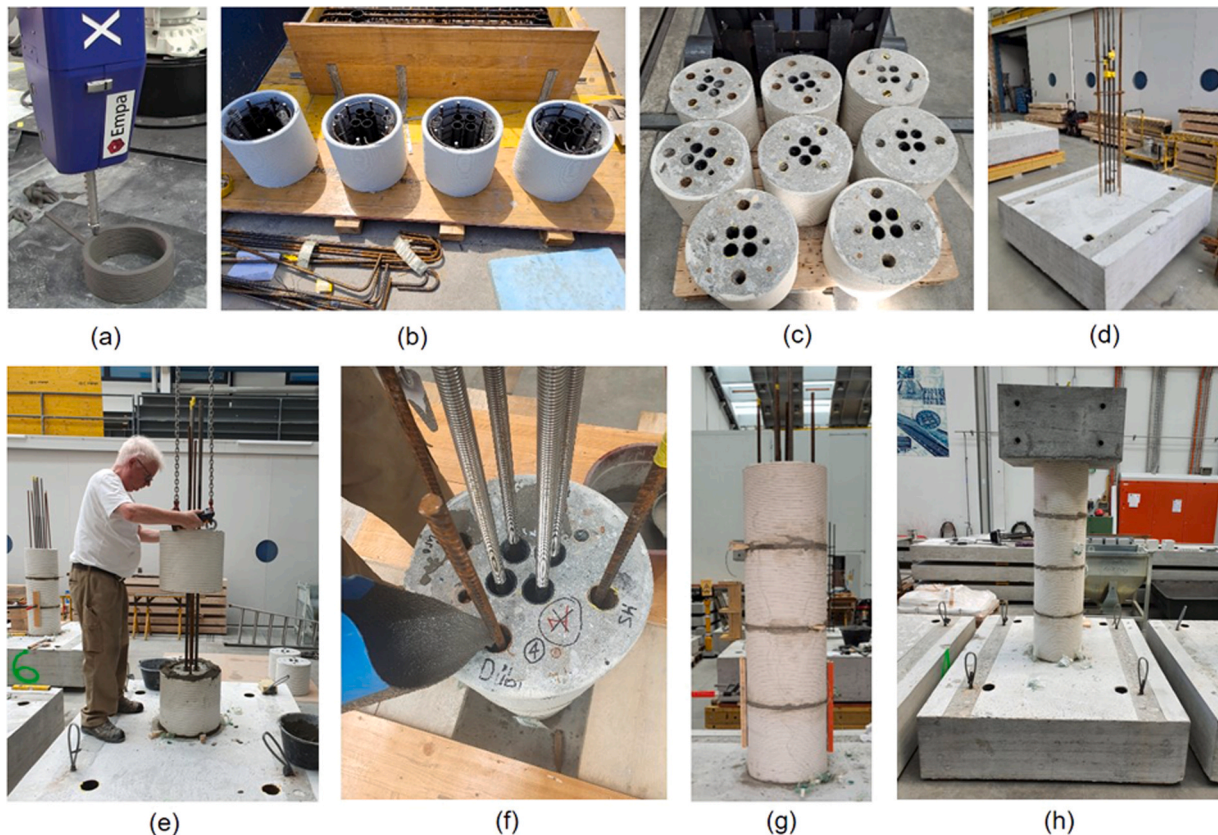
Construction and assembly procedure: a) fabrication of hollow 3DPC formwork shells; b) installation of reinforcement cage and ducts in segments; c) segments filled with cast concrete; d) cast footing with continuous ED steel and Fe-SMA rebars; e) stacking of segments over footing; f) grouting of ED steel and Fe-SMA rebars; g) assembled column segments; h) completed column assembly with top loading block.
